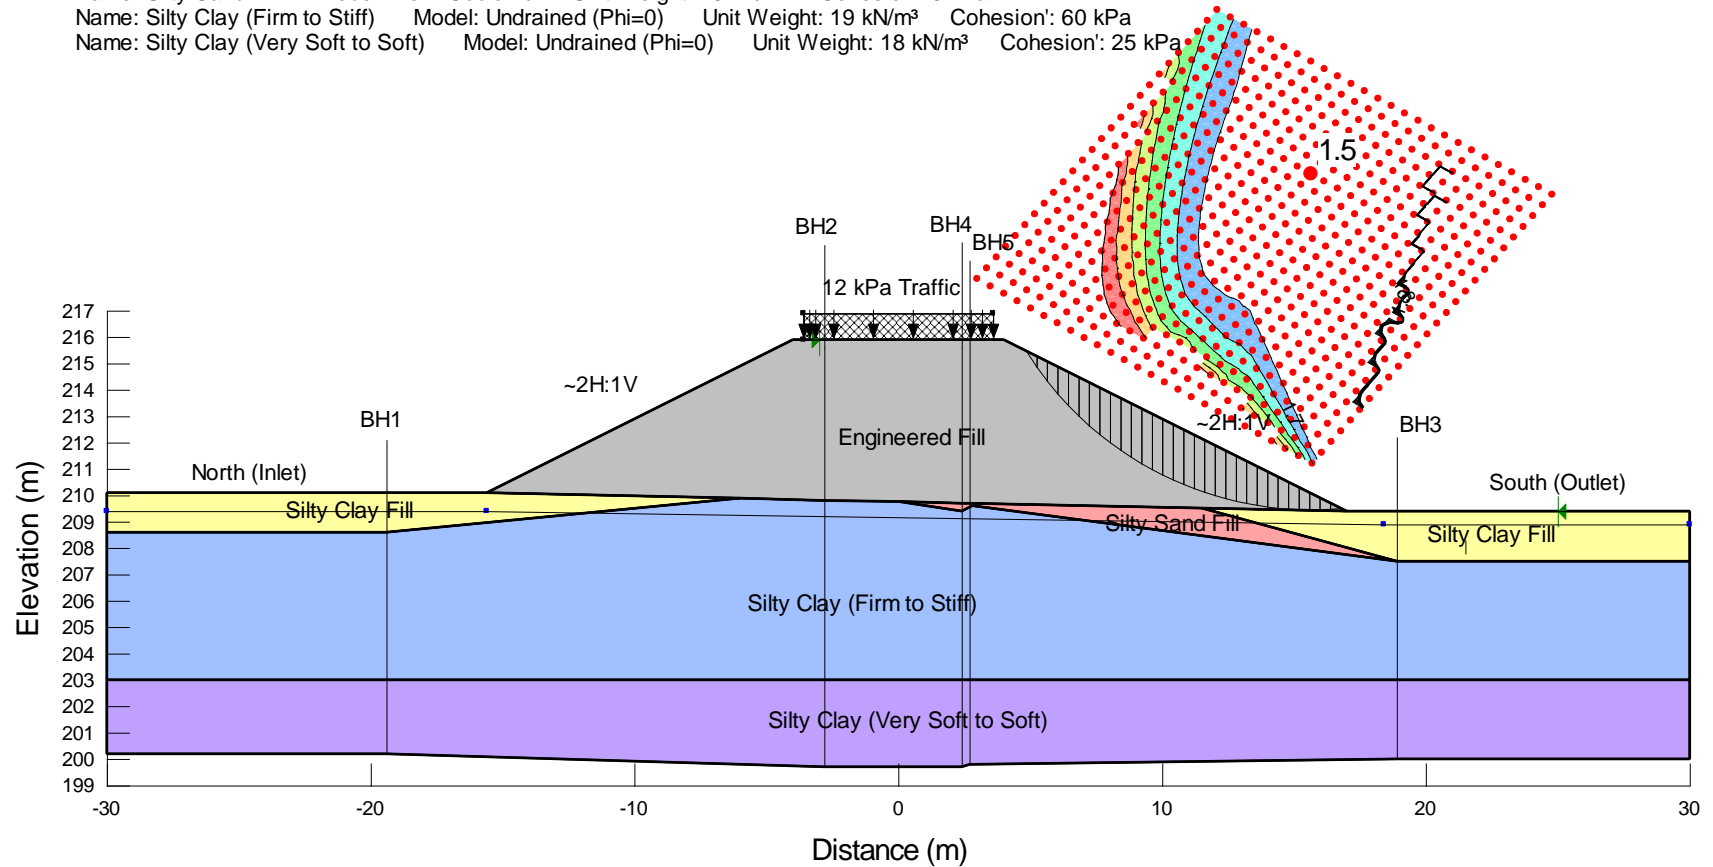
South embankment (outlet) – undrained static condition with 2H:1V slope and engineered fill below embankment
